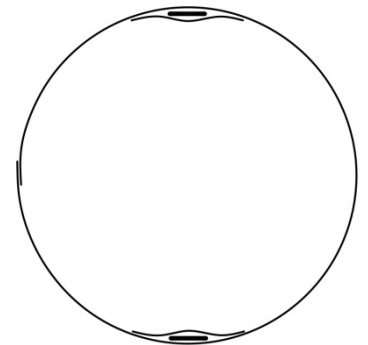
"O SECTION" OF THE SEGMENTED TENSAIRITY® ARCH
